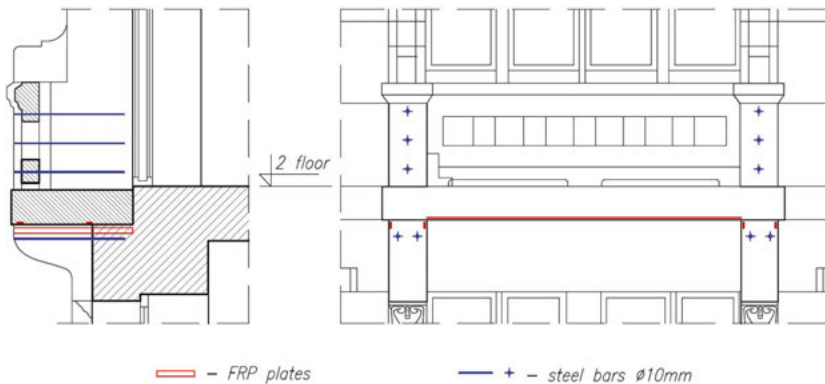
Warsaw, Kredytowa street 3. Design of strengthening and protecting stone balconies. Section (left) and elevation (right) of balcony
